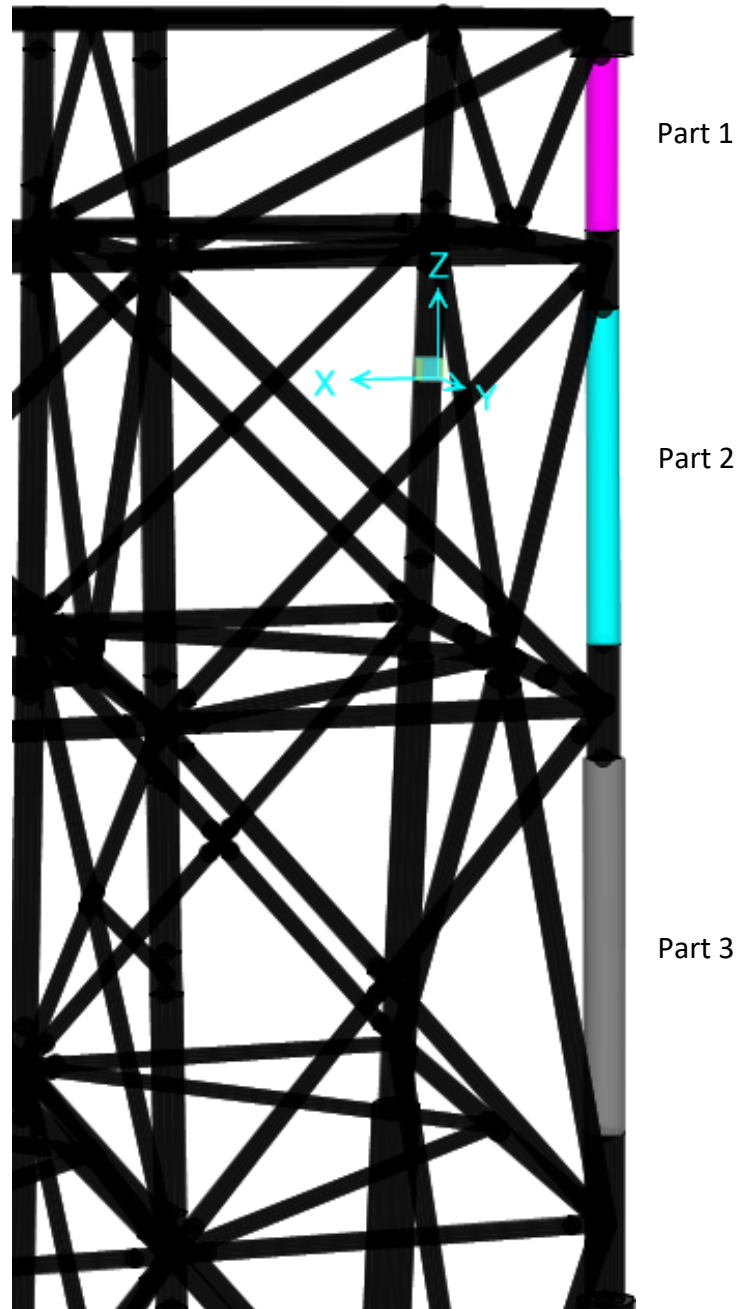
Part 1, 2 and 3 of Leg A were filled with grouting
